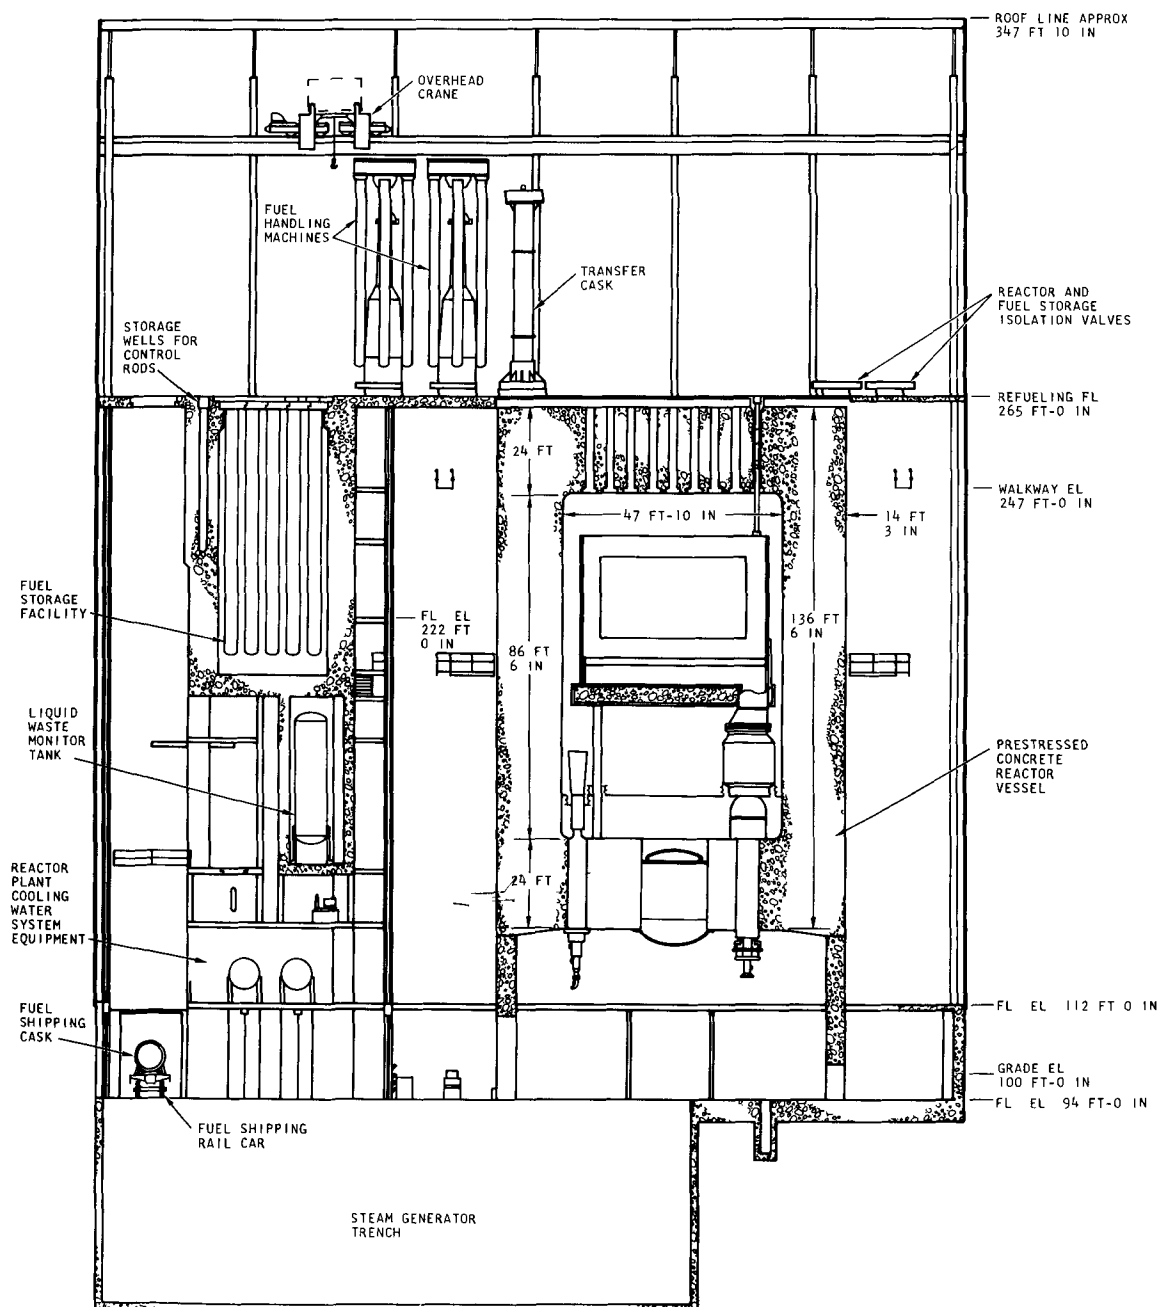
Reactor Plant Arrangement, Section. (GGA illustration)
